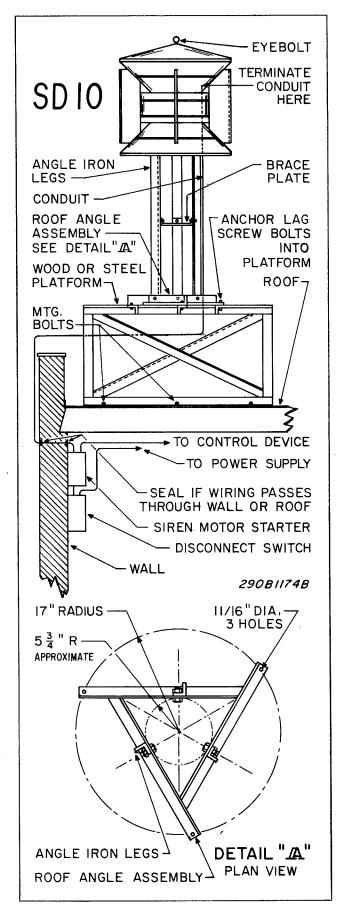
Typical SD10 Platform-Mounted Installation.
